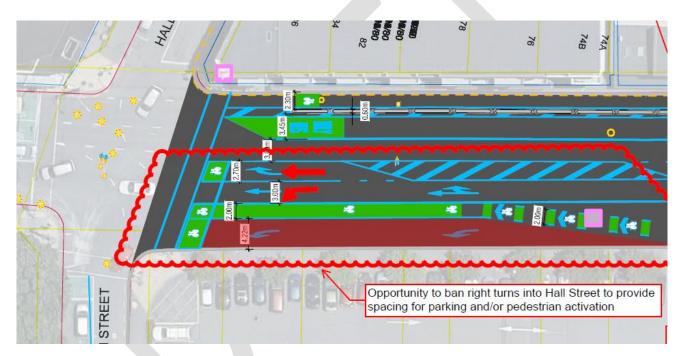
Excerpt from plan - Riddiford Street / Mein Street / Hall Street intersection (C101A)
